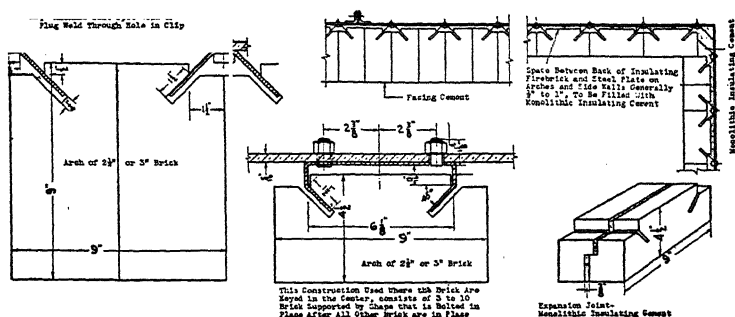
Method of constructing flat arch and side walls of insulating brick supported by steel plates.
